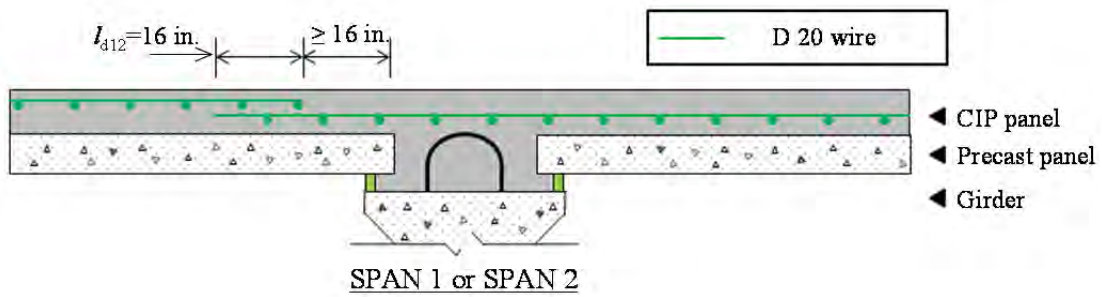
Details of transverse splice, Lampasas River Bridge (Section O-O)
